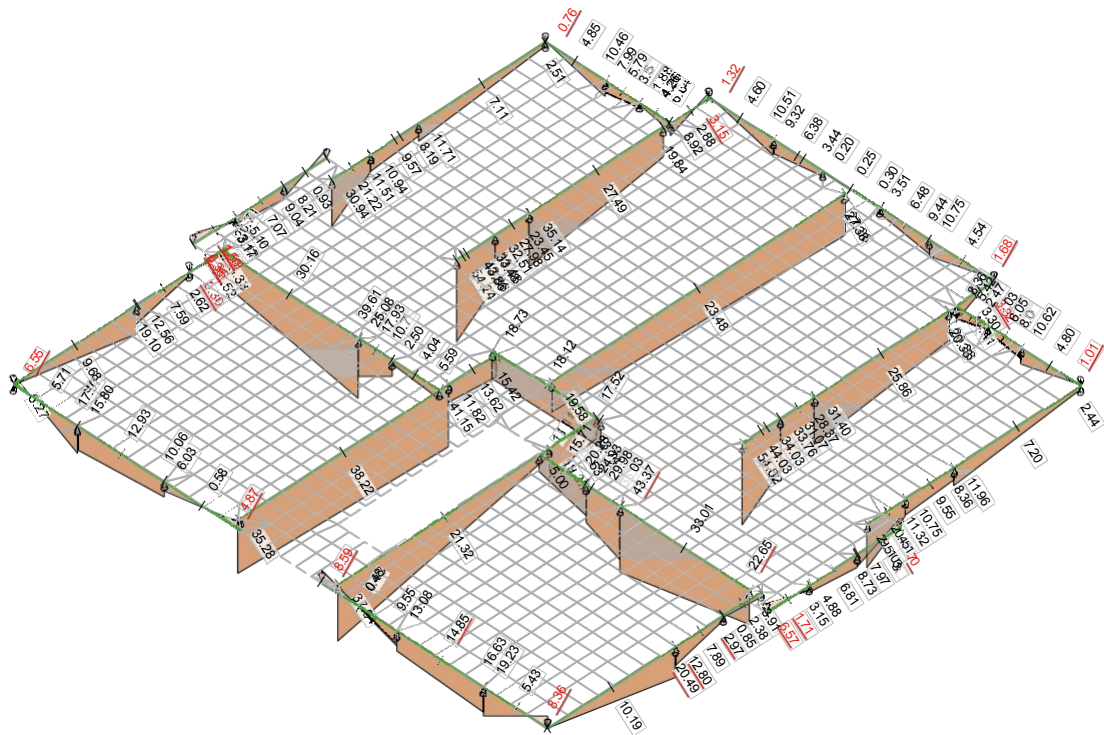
Linearised support forces of the ceilings on the ground floor - 3rd floor from permanent loads (LF g)
